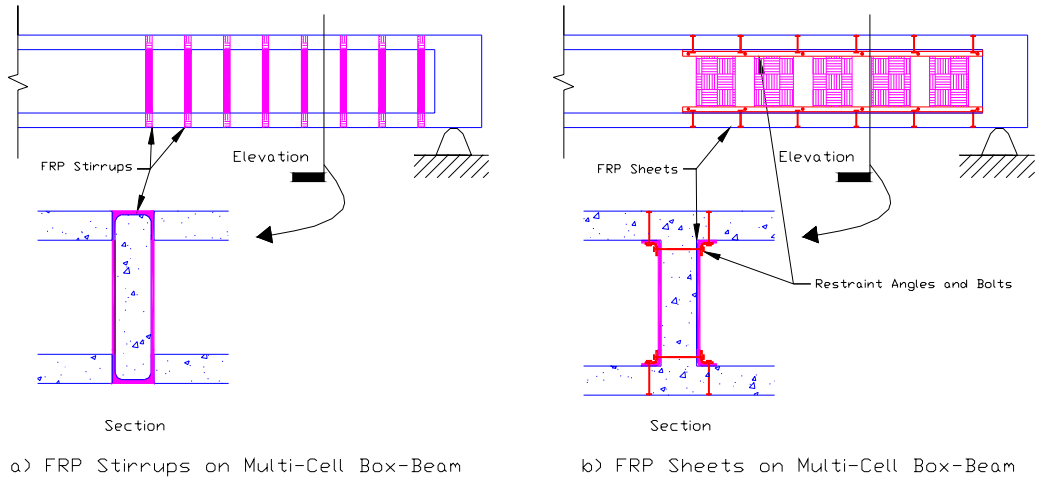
Typical shear strengthening of multi-cell box girder bridge
